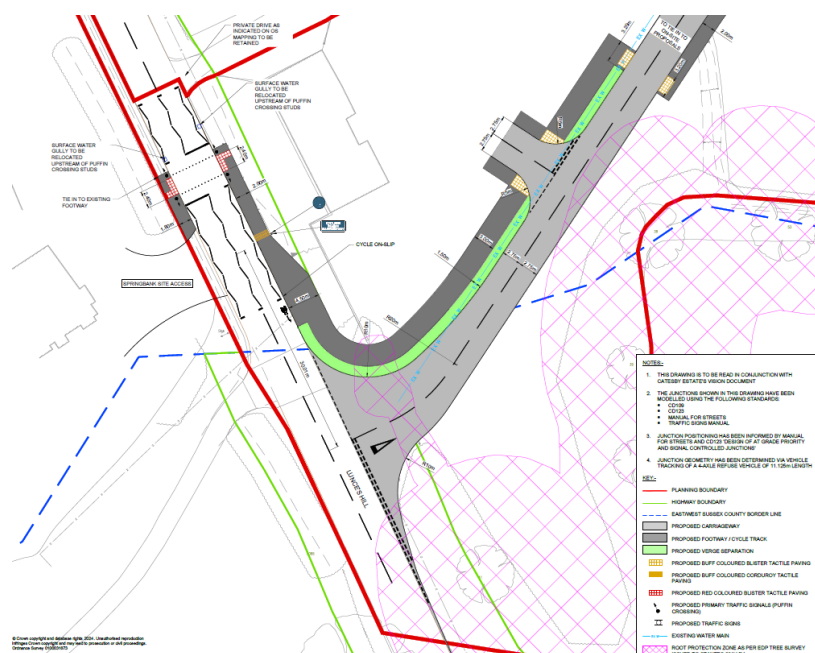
Plan showing the access point to the B2112 (Lunce's Hill). Source: Transport Assessment.
